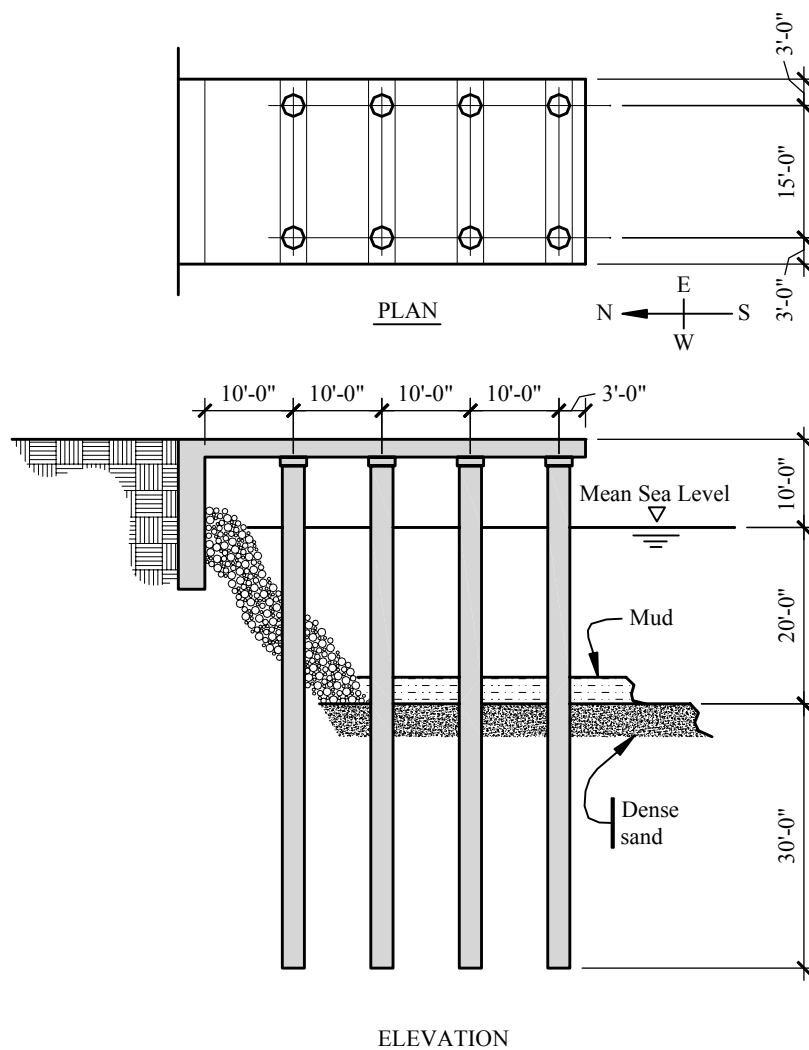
Pier plan and elevation (1.0 ft = 0.3048 m).
